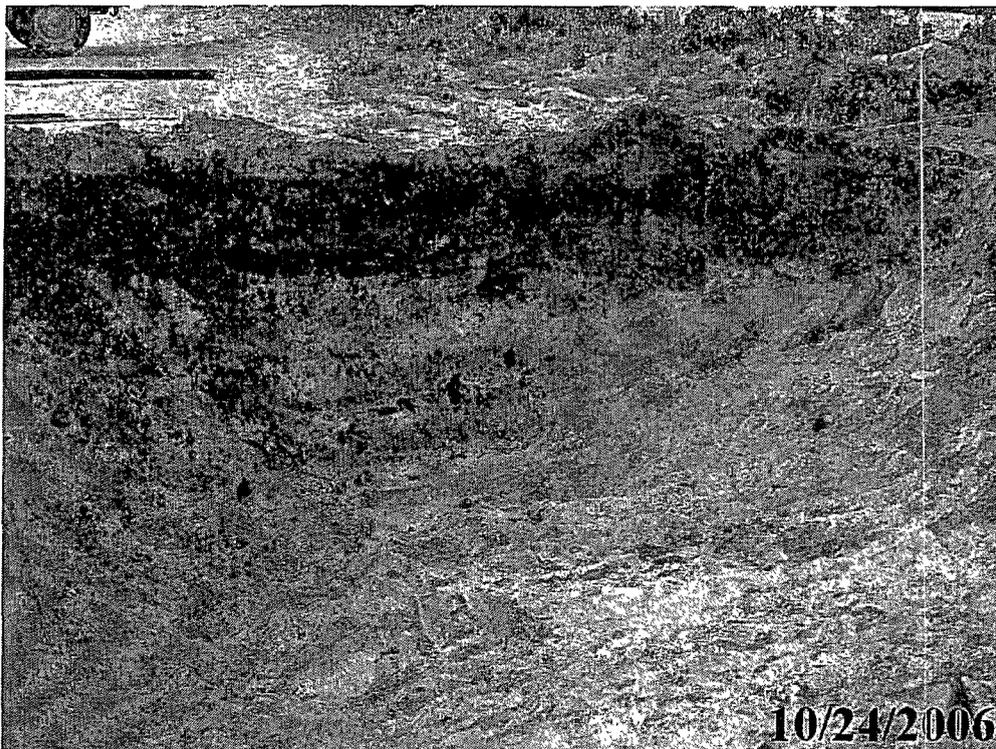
Looking northerly across Site #2 upon completion of backfilling.
